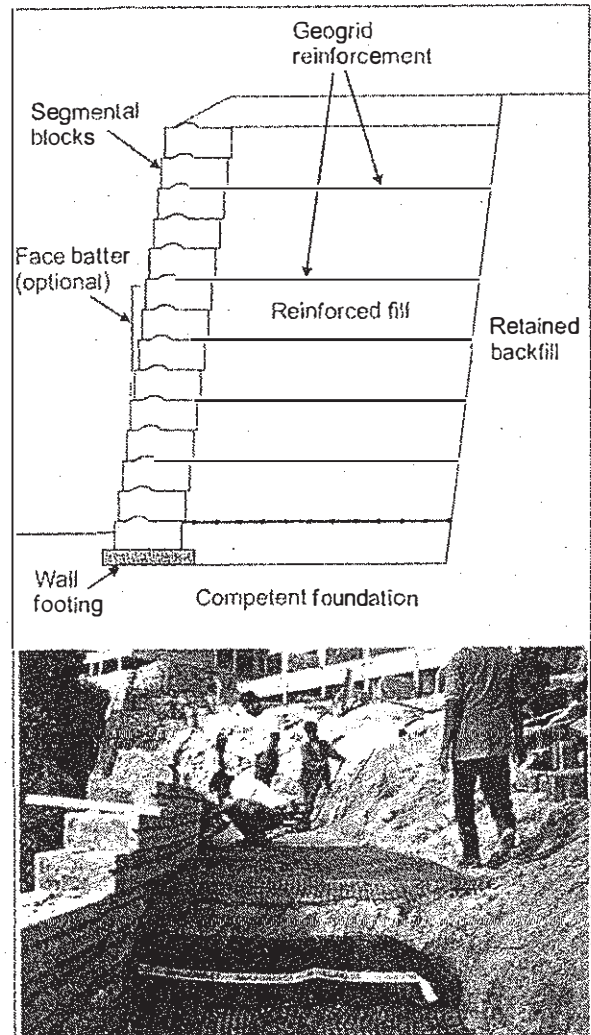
Layout of reinforced segmental block wall showing the various system components.
